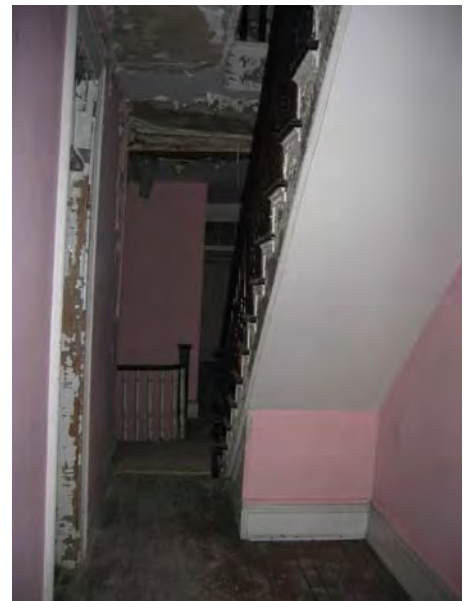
Sloped ceiling below stair. (Photo: BBB, 2007)
